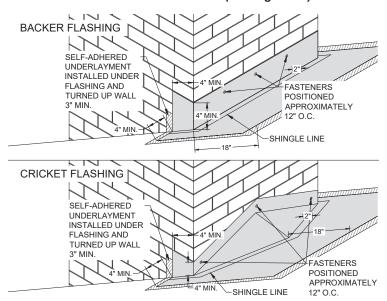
Chimney Saddle and Cricket Flashing Applications
